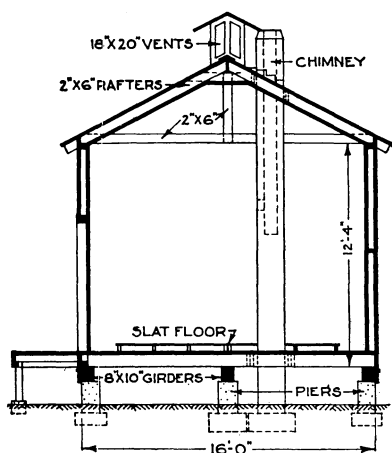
Section through a sweet-potato storage house, size 16 by 29½ feet, having a capacity of about 1,000 bushels in crates, showing various structural details
